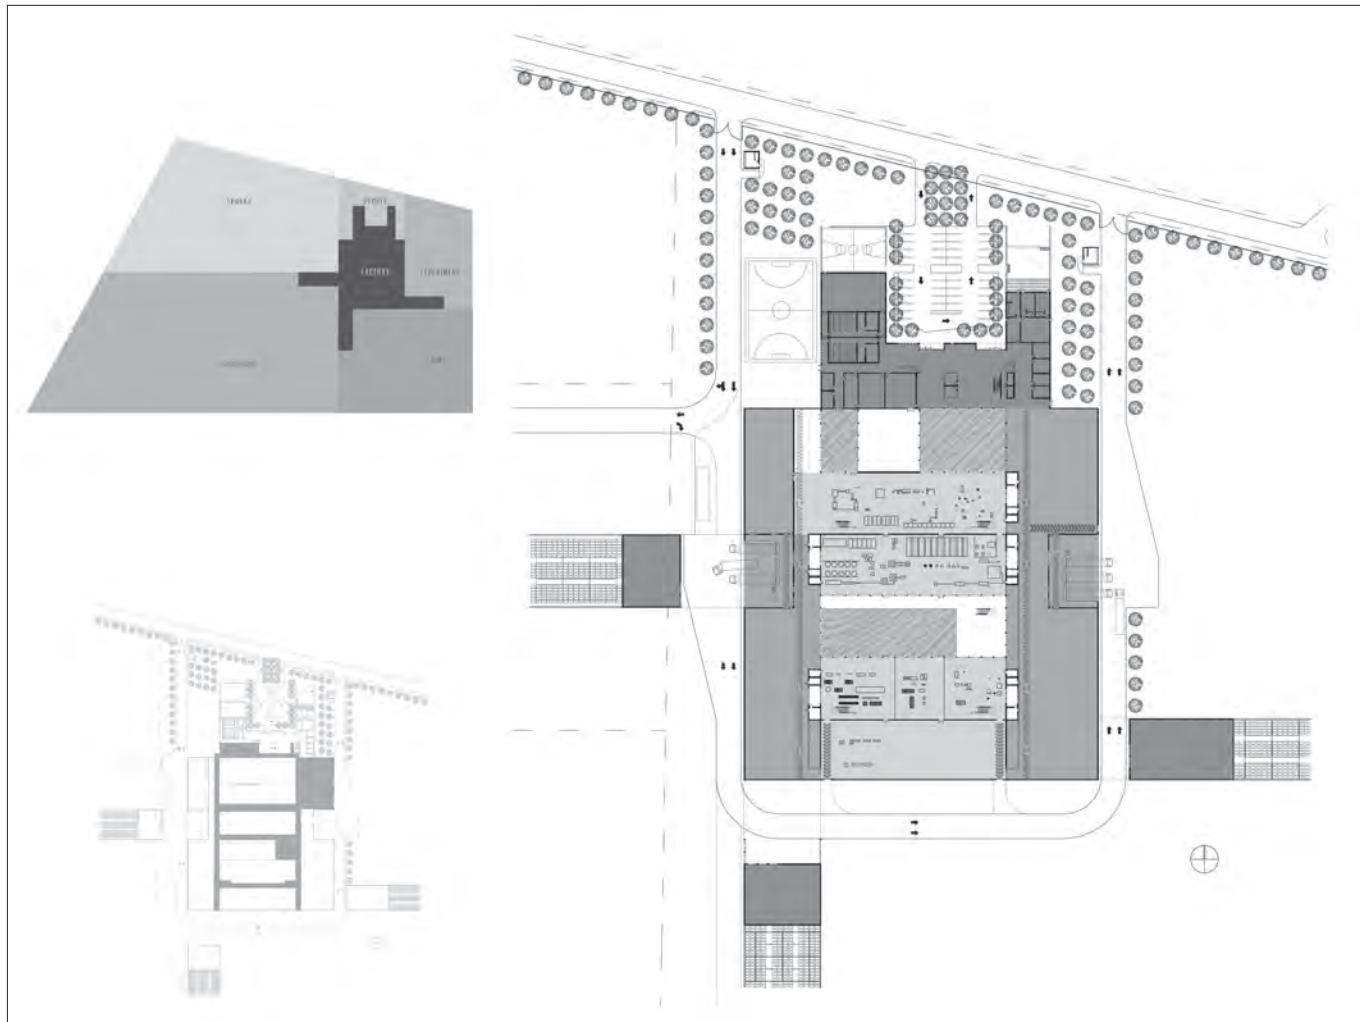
Food Canning Factory, ground-floor plan, site plan, and upper-mezzanine plan.
